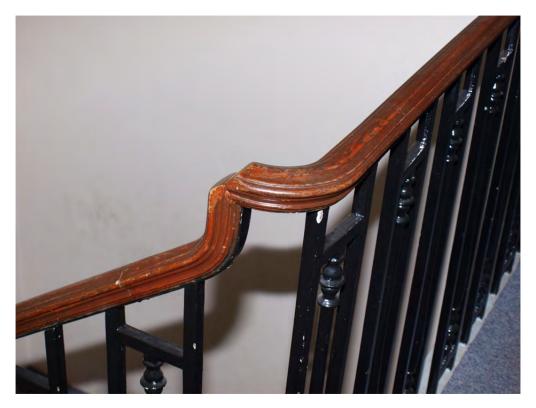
Phase 1 – Block 1a staircase with awkward ramp junction on the handrail
